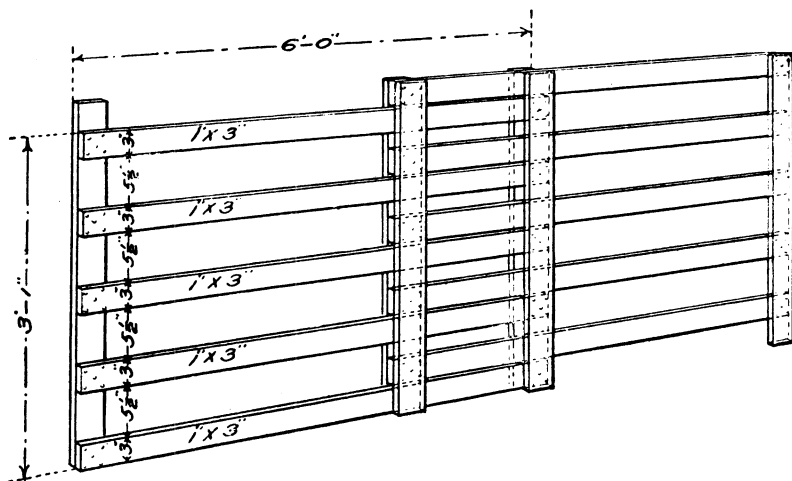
Extension hurdle. May be closed up to 6 feet 4 inches or extended to 11 feet 4 inches.
